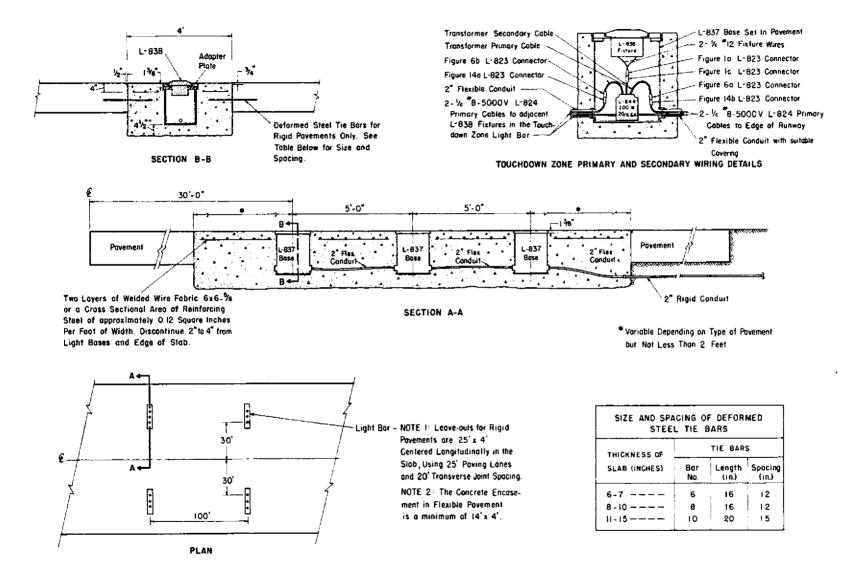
INSTALLATION DETAILS - TOUCHDOWN
